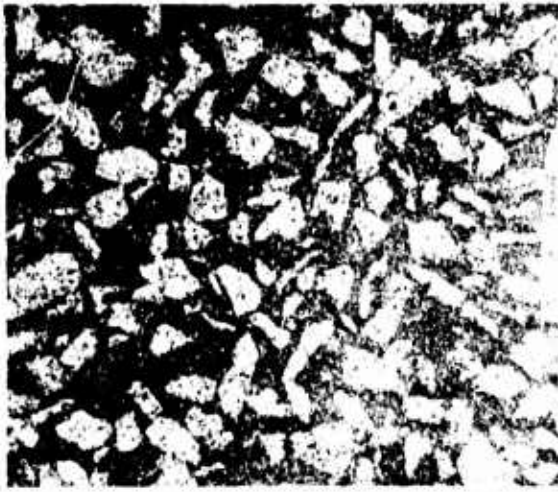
Exposed aggregate surface produced by mechanical fracturing (bushhammering).
